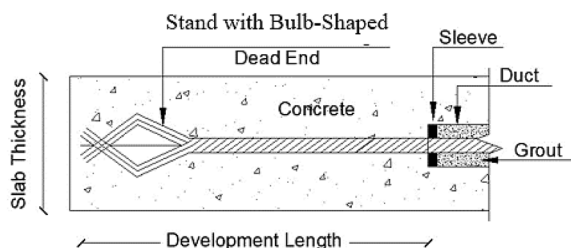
Development length of post-tensioning slab with bulb-shaped dead end anchorage
